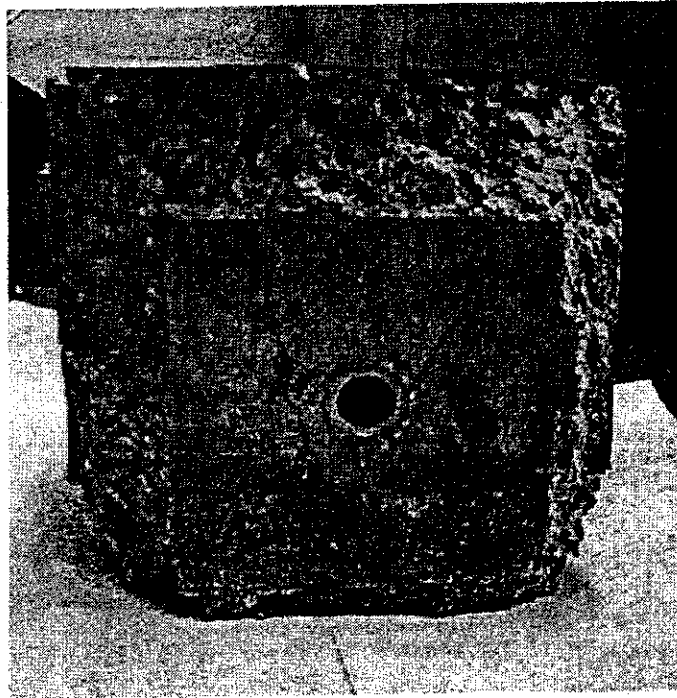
Plan View of C-N-L-1 after Failure Showing Concrete Spalling at Corners
